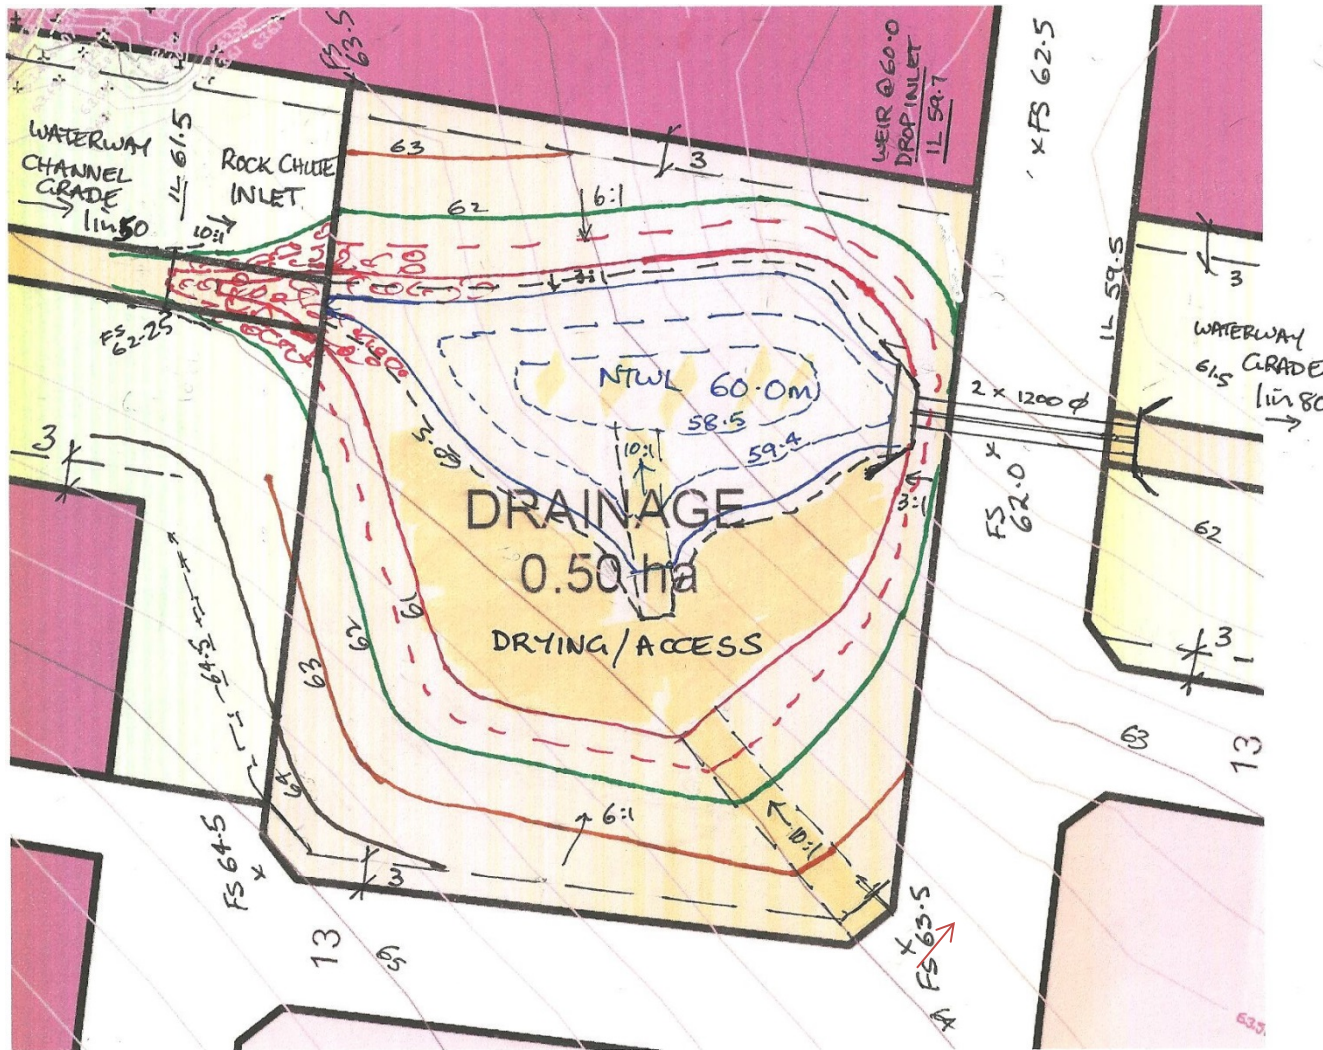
Concept Layout for SBRB1 in 151-229 Anglesea Road
